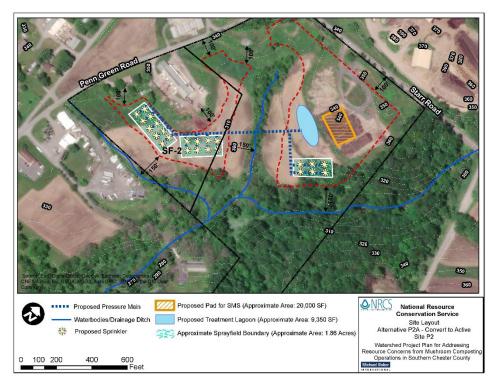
Conceptual site plan to collect and treat mushroom compost leachate on evaluated site P2.
